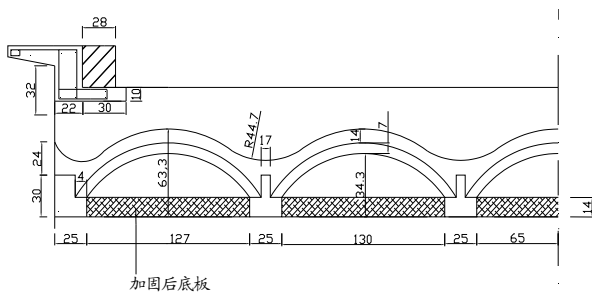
The main arch ring cross-section after the reinforcement (units: cm)
